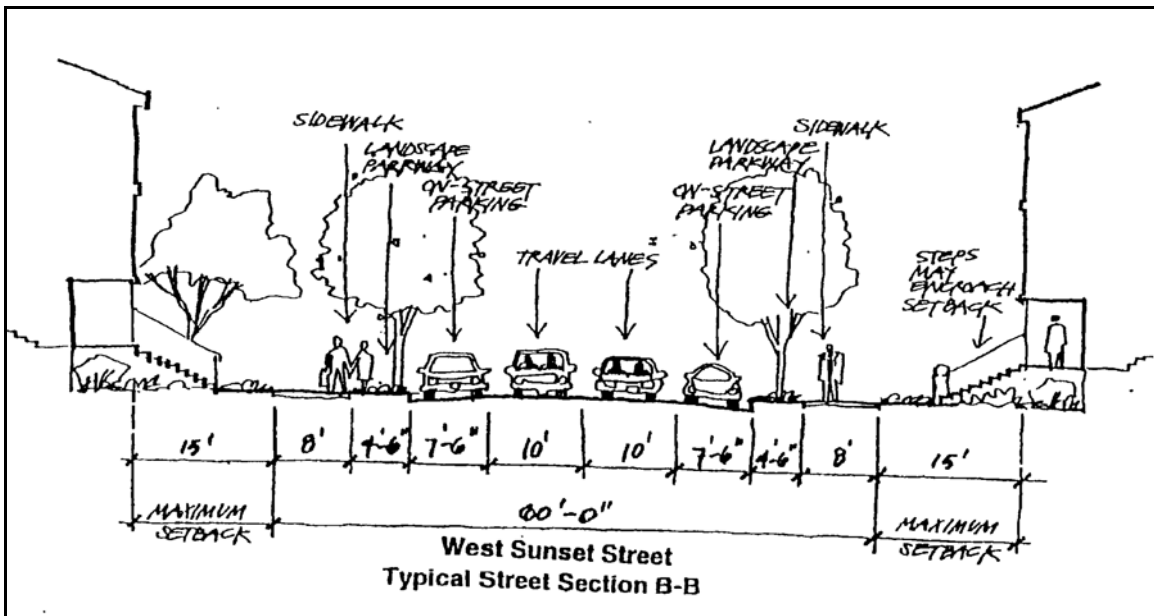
F: West Sunset Street Typical Section B-B
